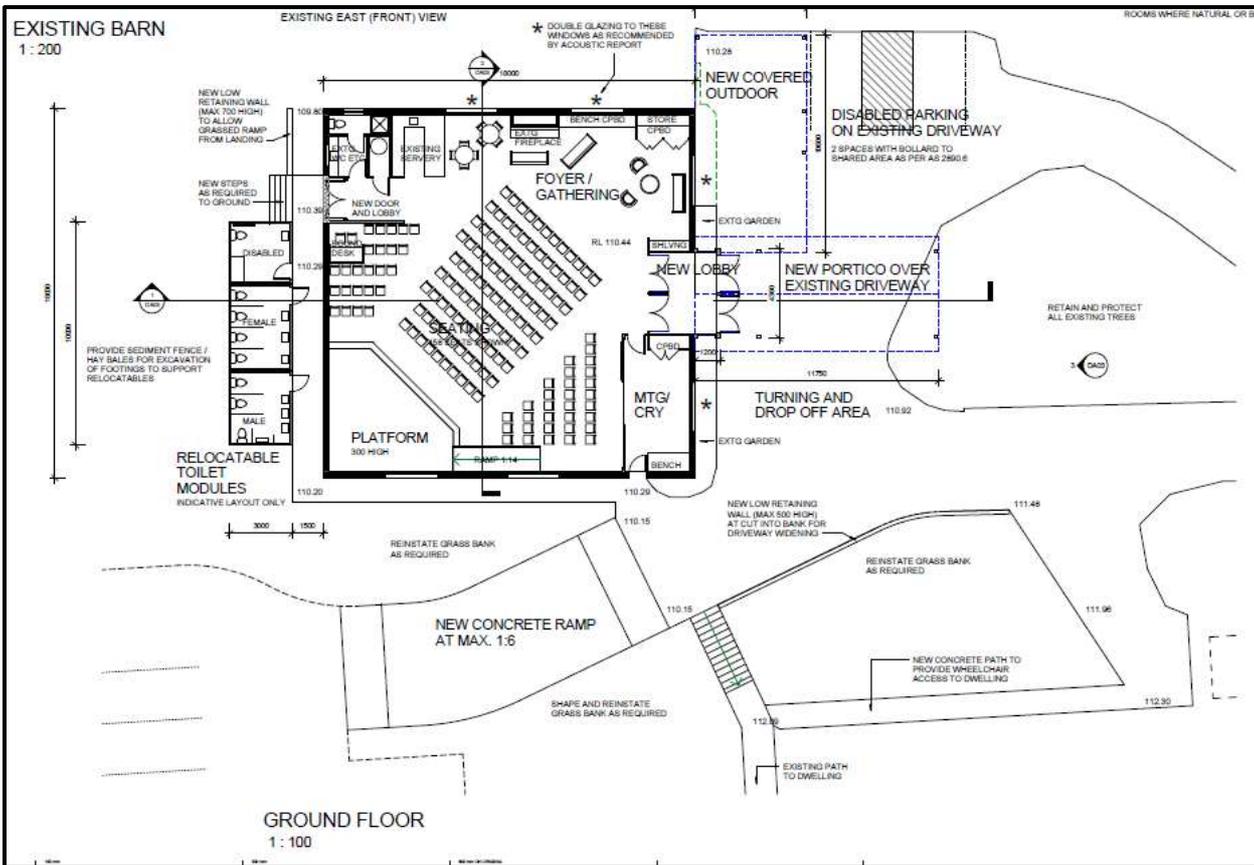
Proposed ground floor plan of proposed place of public worship at 30 Fox Valley Road, Denham Court.
